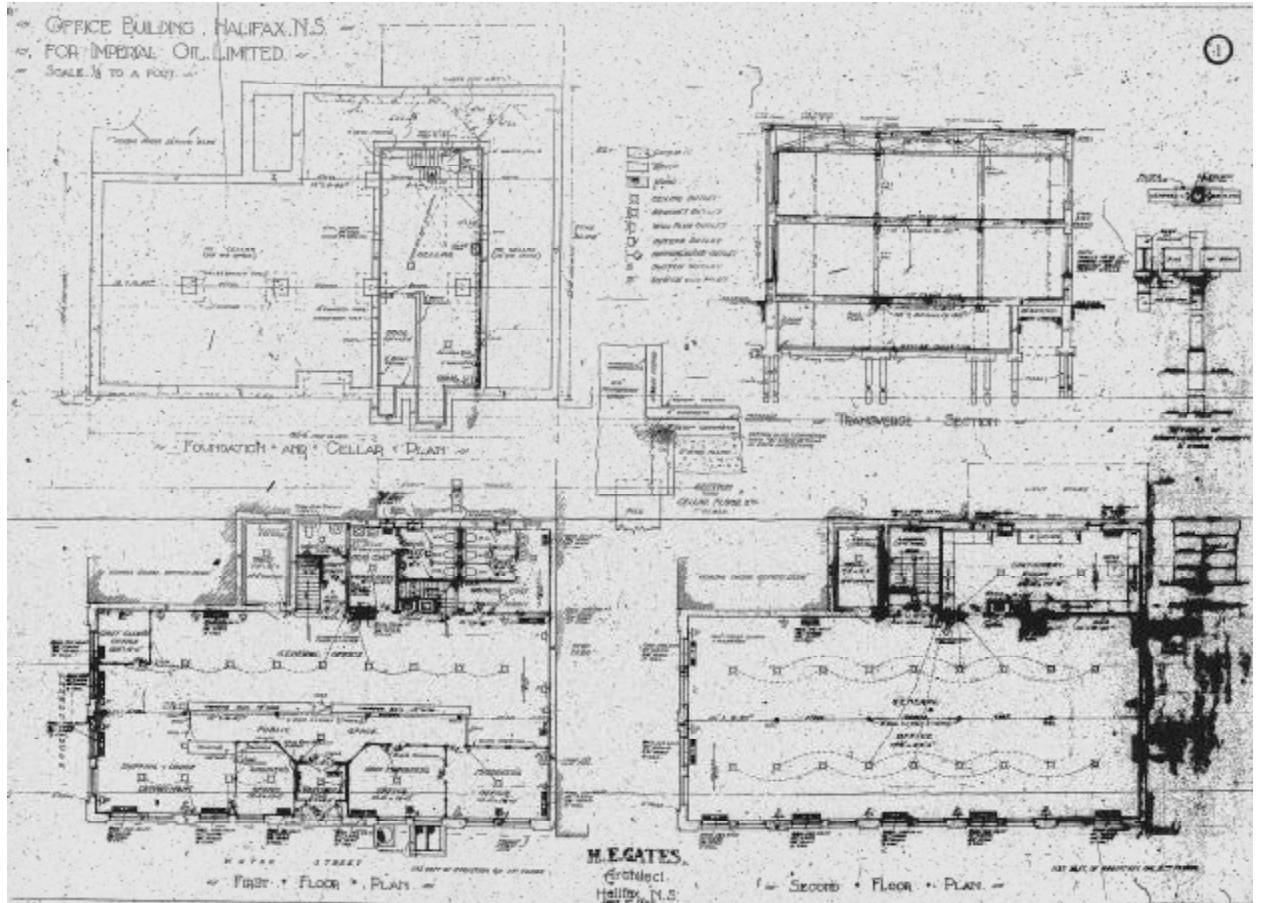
The Imperial Oil Building blueprints: cellar, first, and second floorplans, as well as sectional views.
